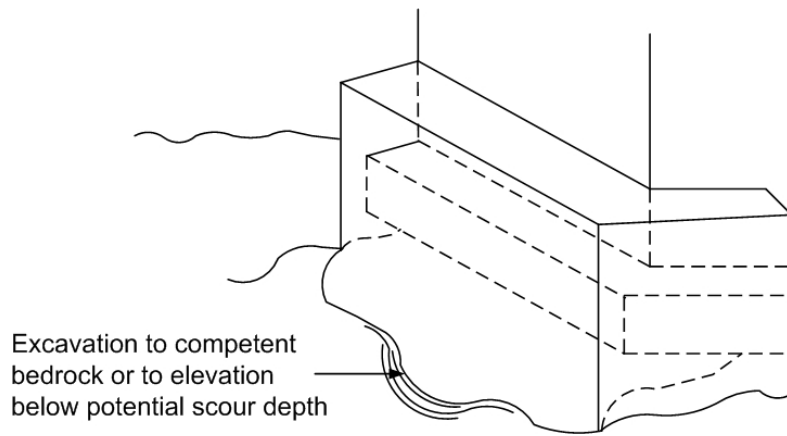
Concrete Footing Apron to Protect a Spread Footing from Undermining
